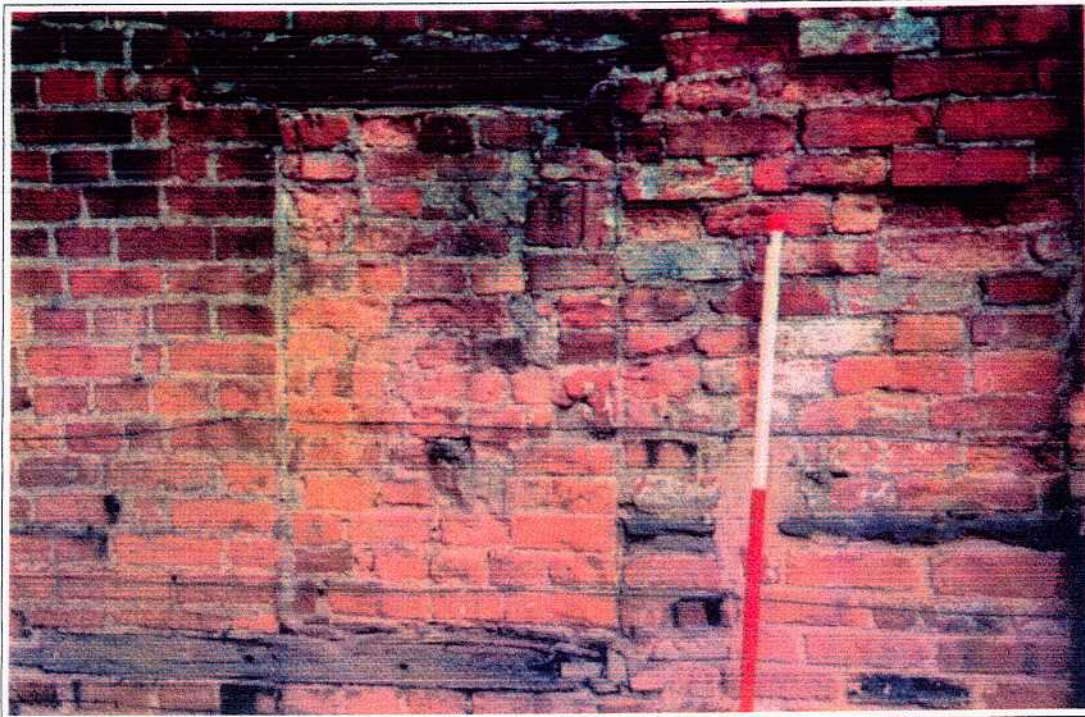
Bricked up window in boundary wall to the rear of 9 St Owens Street
